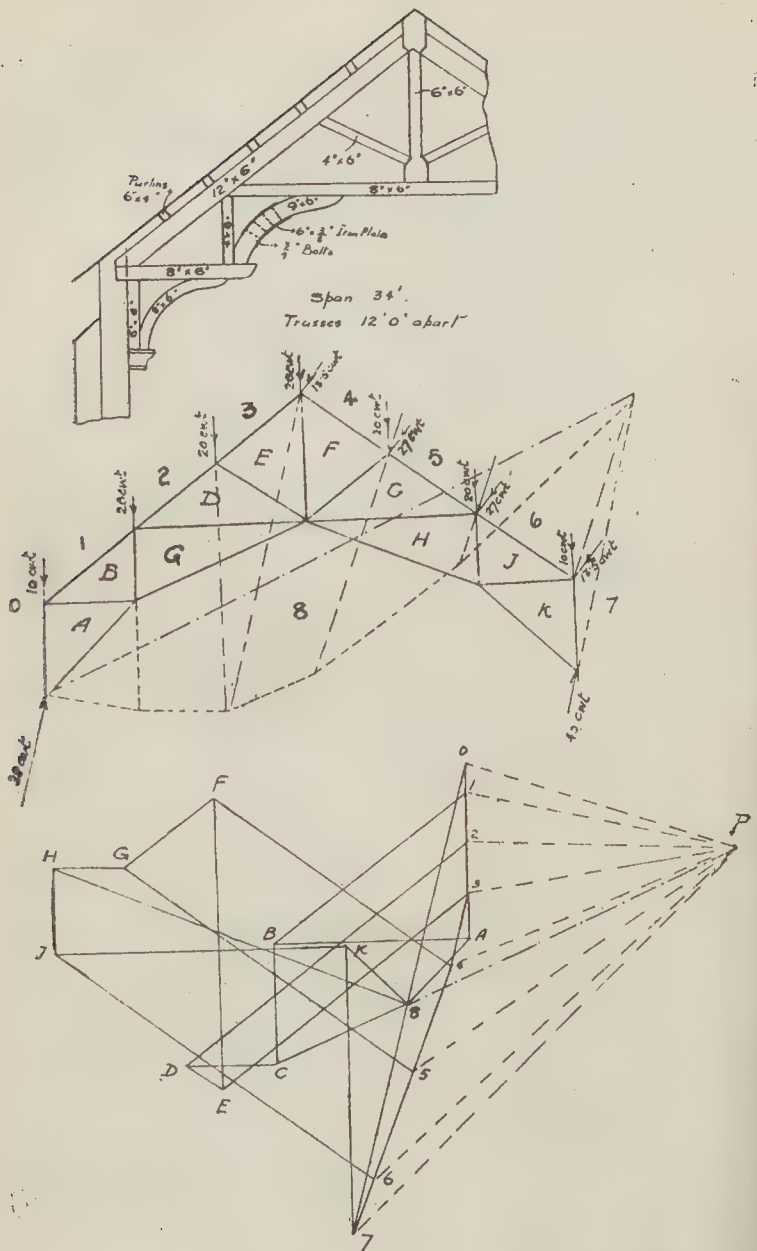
Hammer Beam Trusses. (Builders' Journal.)
